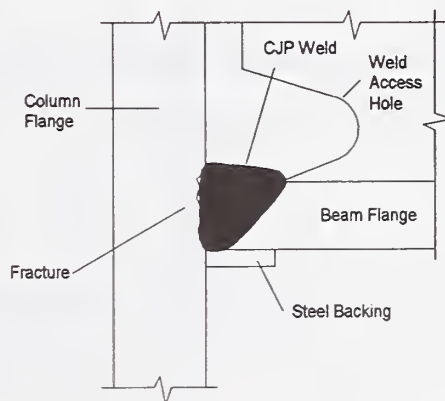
Fracture of Complete Joint Penetration Flange Weld
